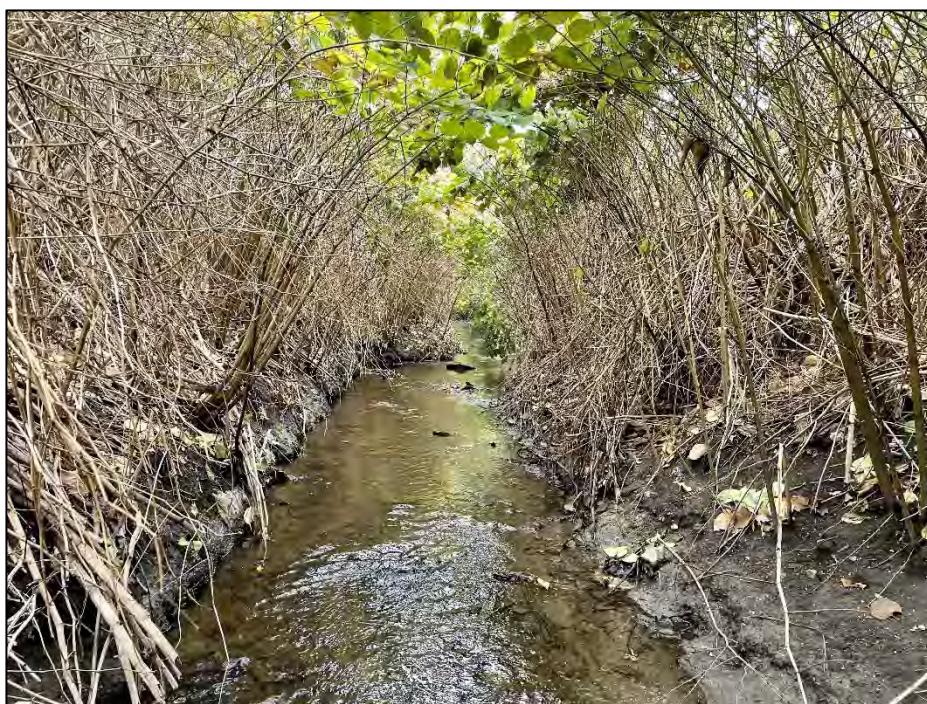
Channel between Curtis Street and inlet of Bloody Brook Culvert. Note overgrowth, sedimentation, and channel banks prone to erosion.
